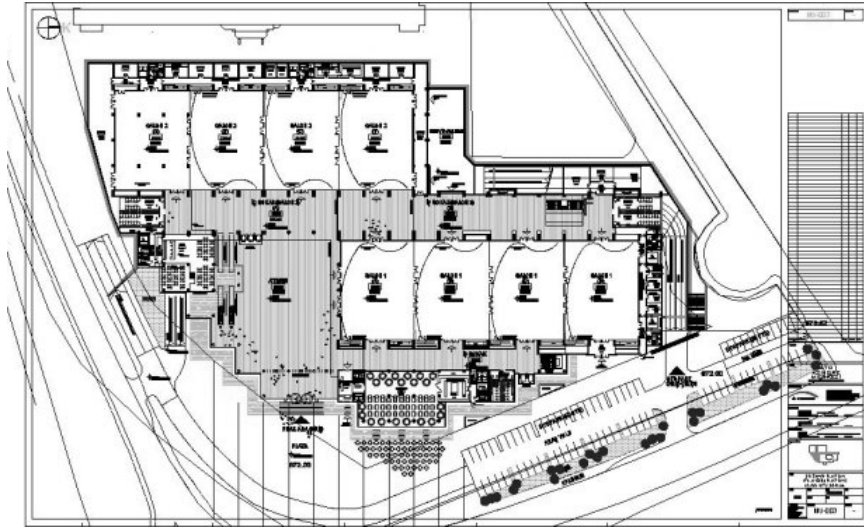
Entrance floor plan of Ankara Chamber of Commerce Fair and Congress
